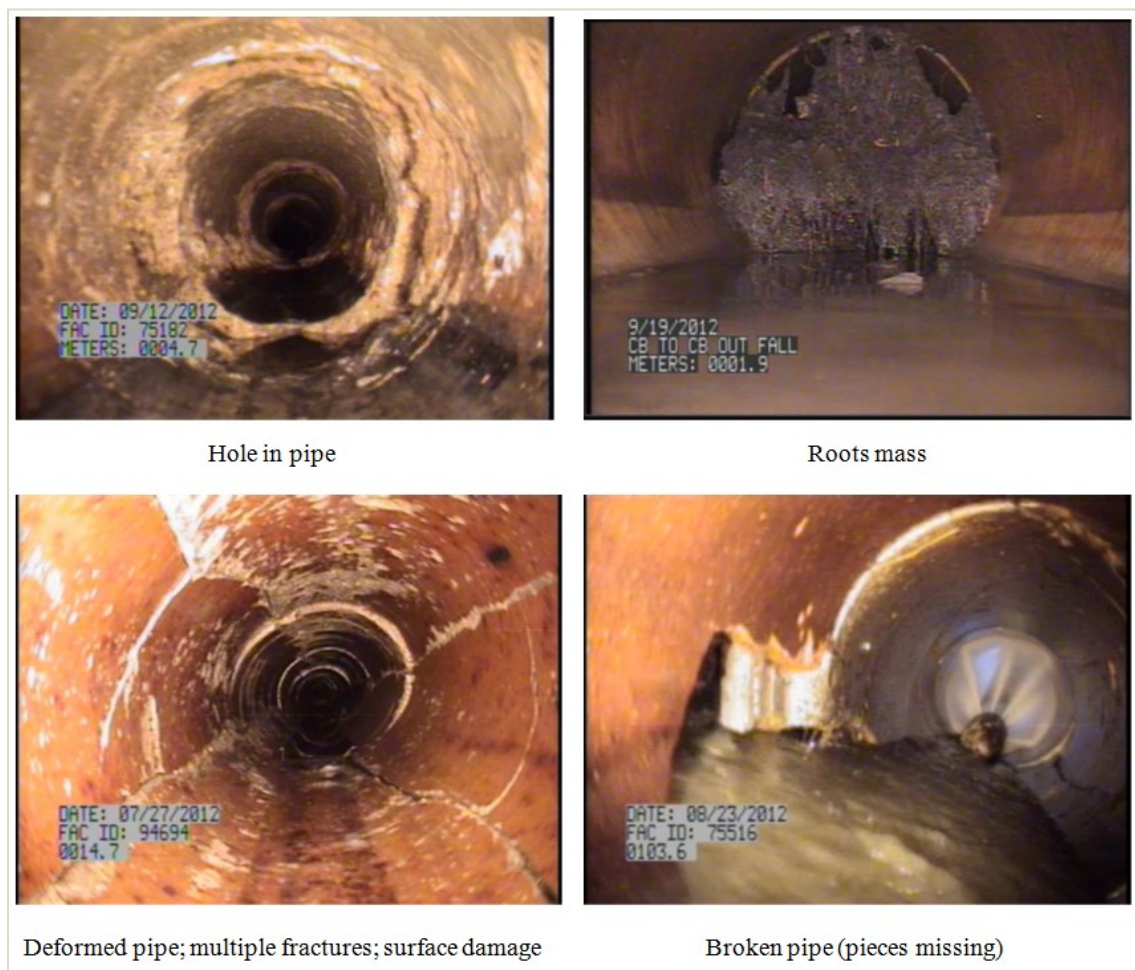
Pipe defects inside a sewer mainline (Navab, 2014)
